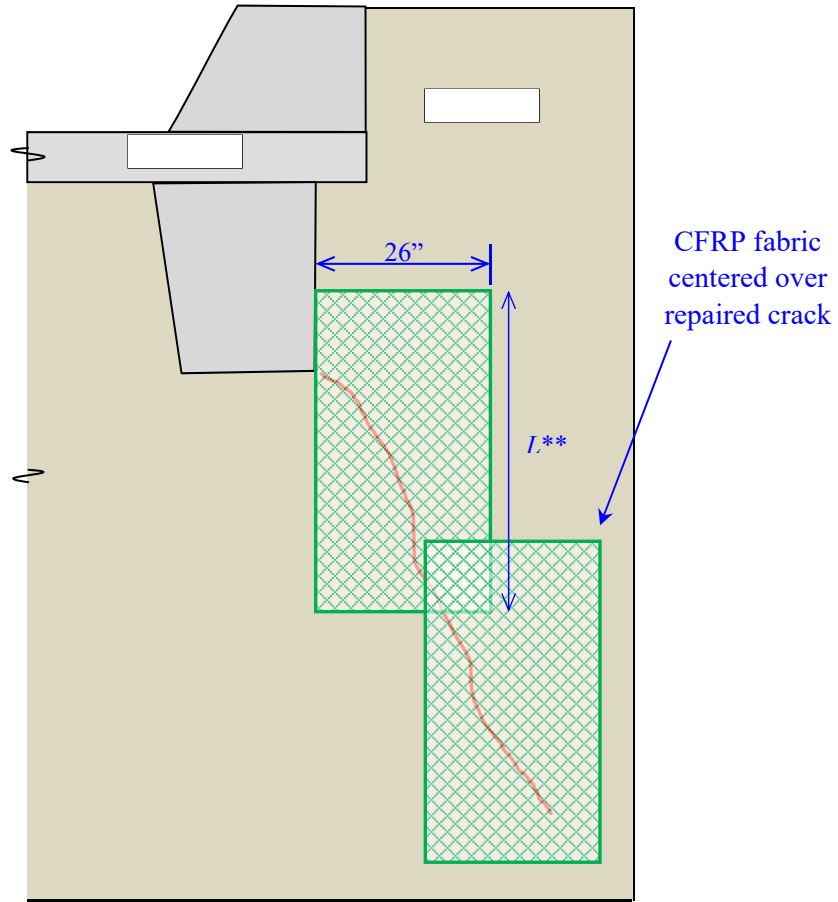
Typical placement of CFRP fabric on cracked abutment under KY 11 over Cat Creek
